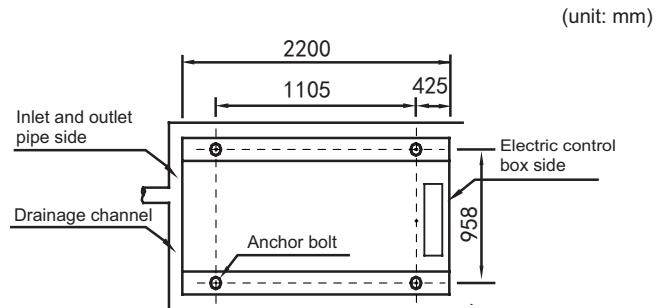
Top view of schematic diagram of installation dimension of KEM-60 DNS3 KH
